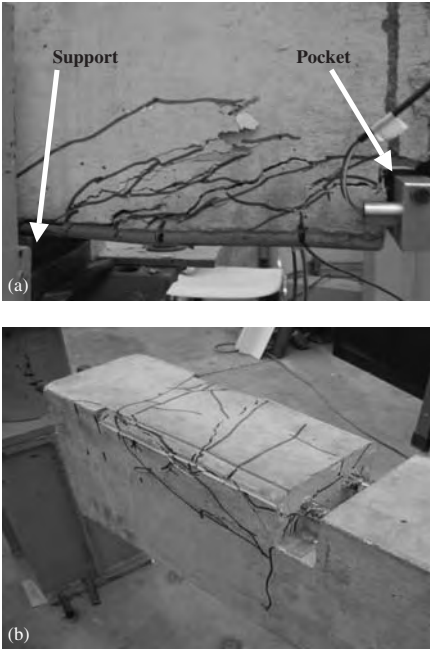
Typical longitudinal cracks for specimens in sets 1 and 3; (a) side cracks, (b) bottom cracks.
